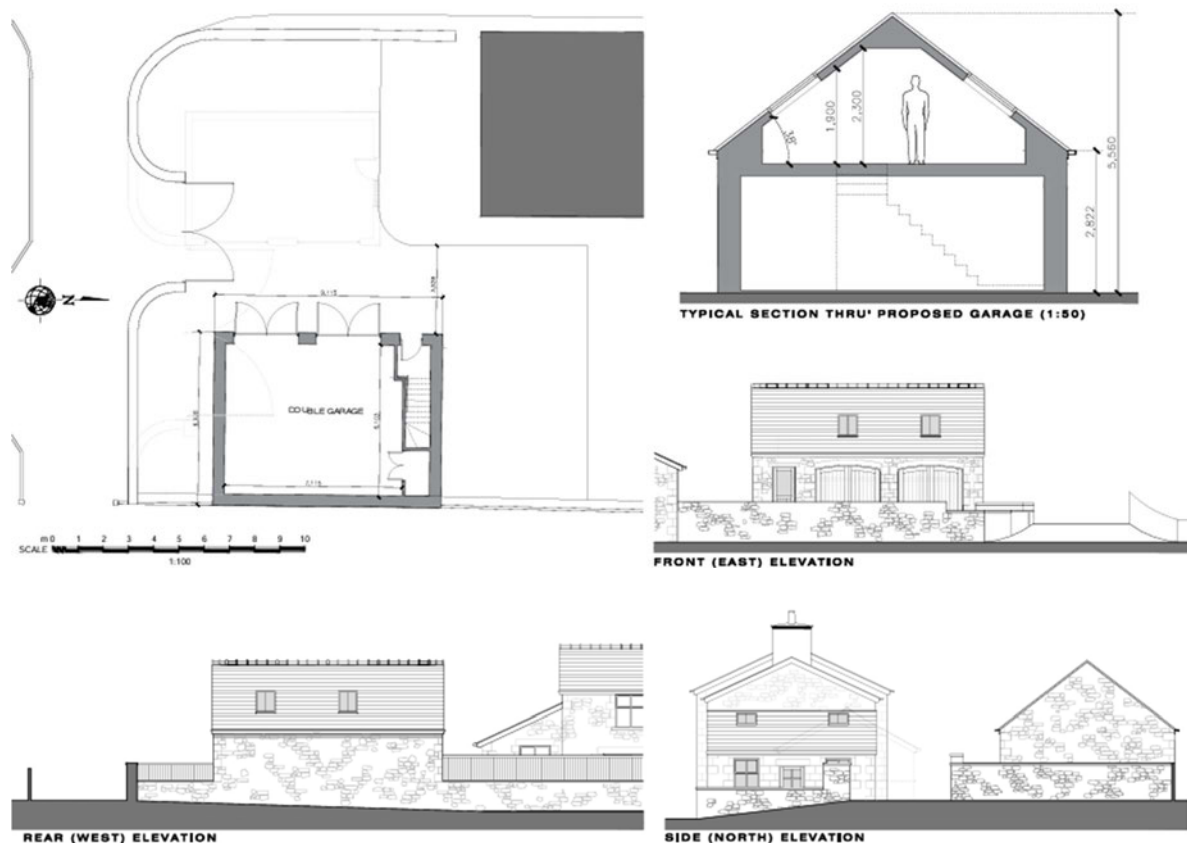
drawing showing the consented garage at Beech House (under planning permission ref no. 3/2016/0664)
